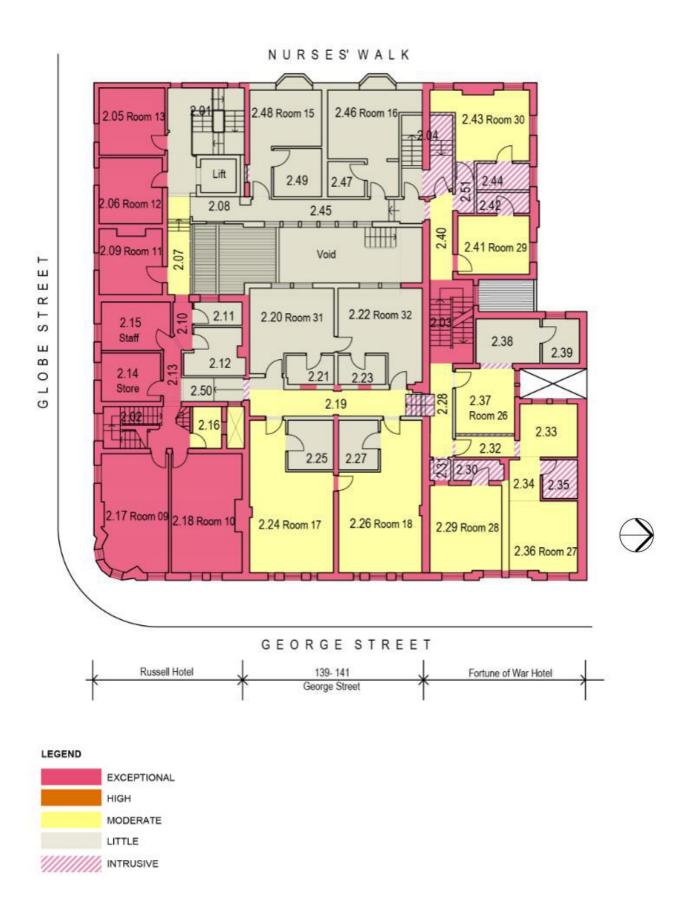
Grading of significance, second floor plan, TKD Architects (not to scale).
